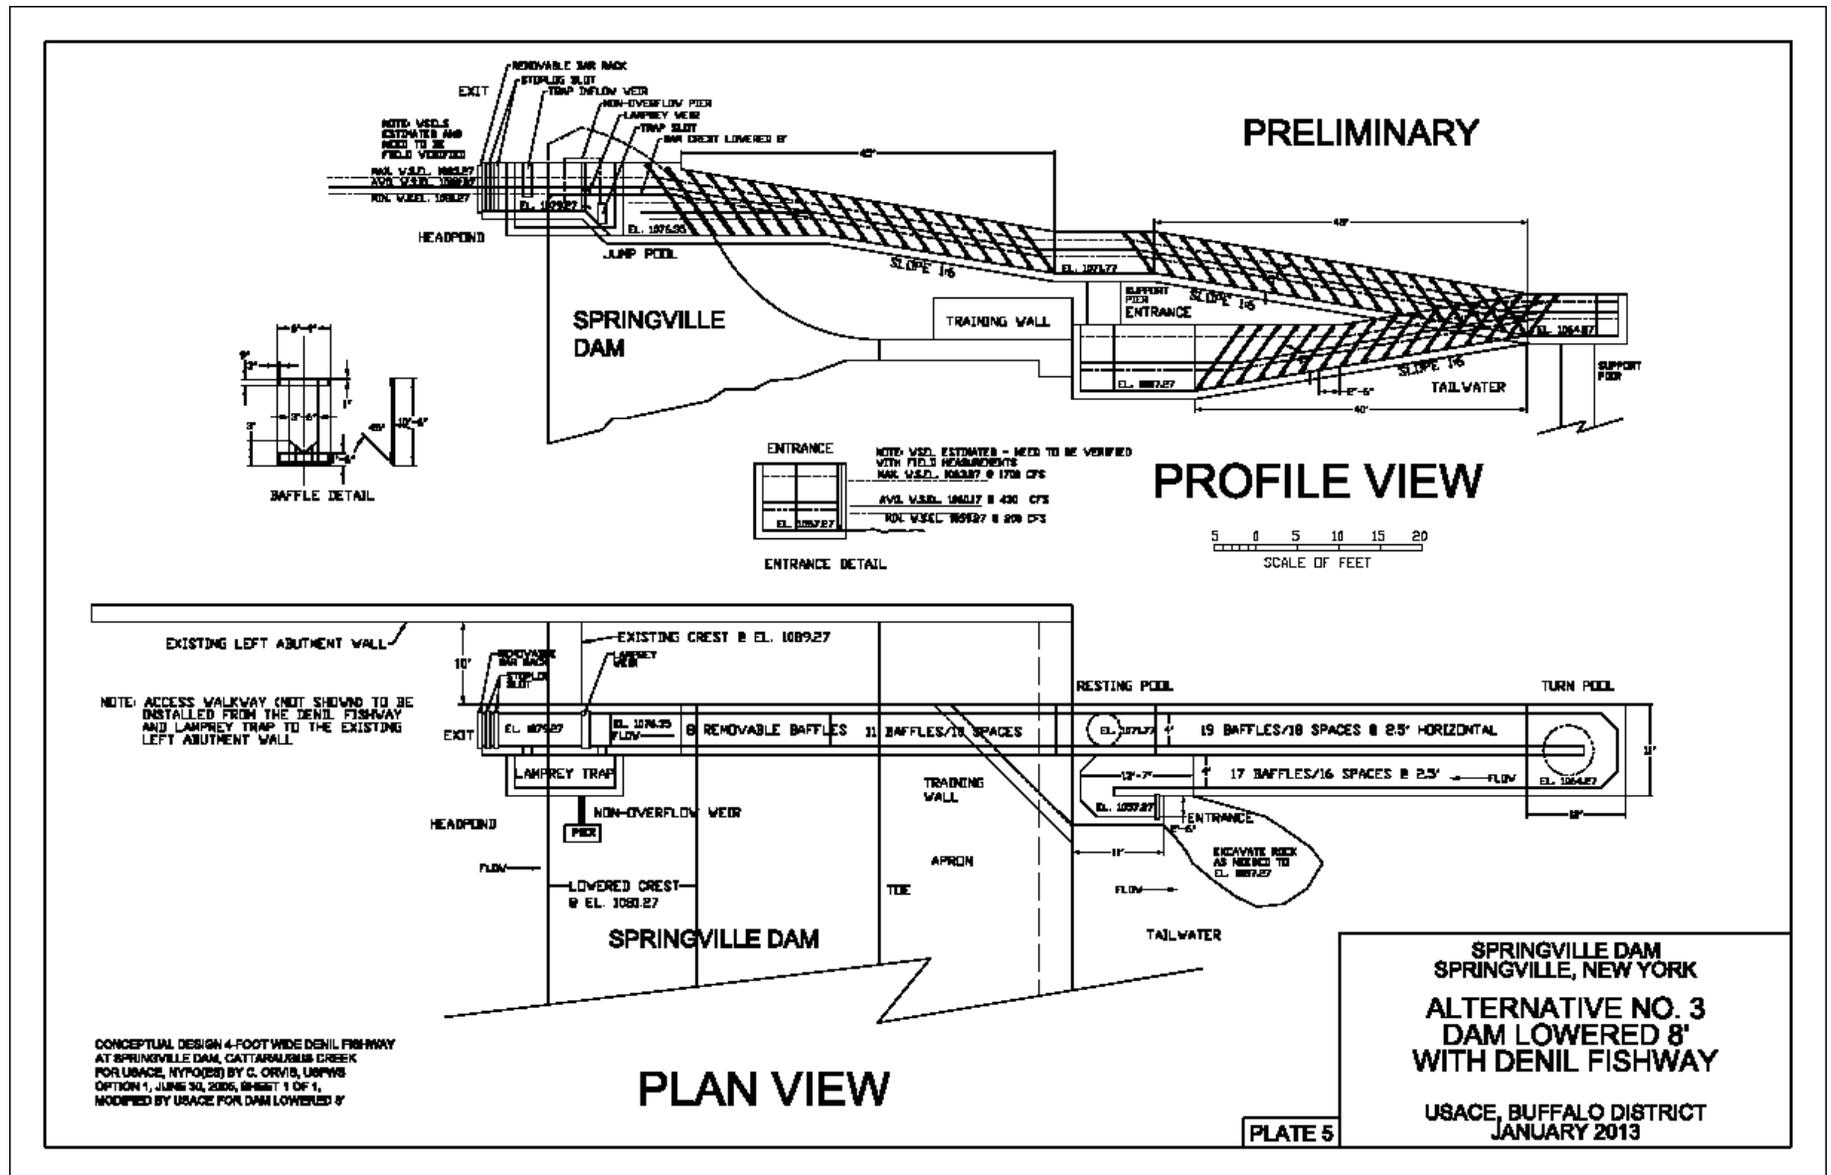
Plan and profile drawings for Alternative #3 – Dam Lowered eight feet with Denil Fishway.
